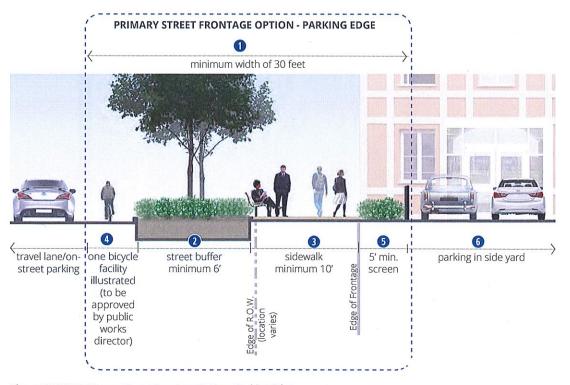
Primary Street Frontage Option - Parking Edge
